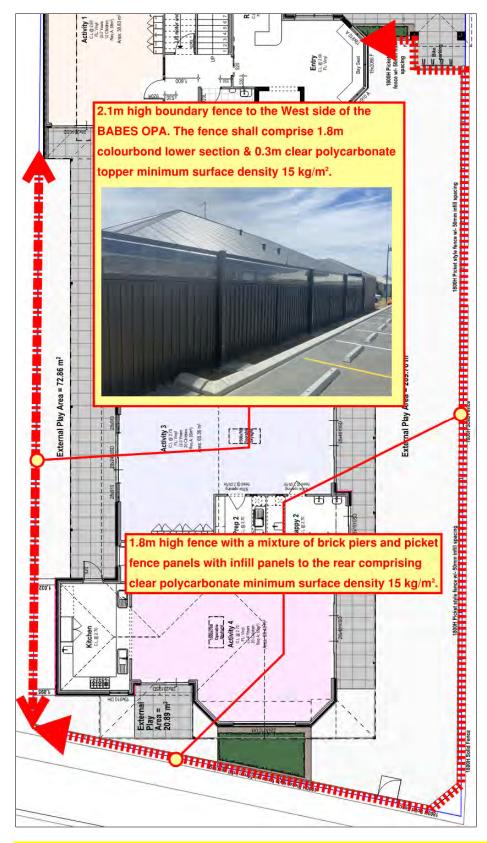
GROUND FLOOR SOUTH - Outdoor Play Areas Noise Barriers Babes/Toddlers
